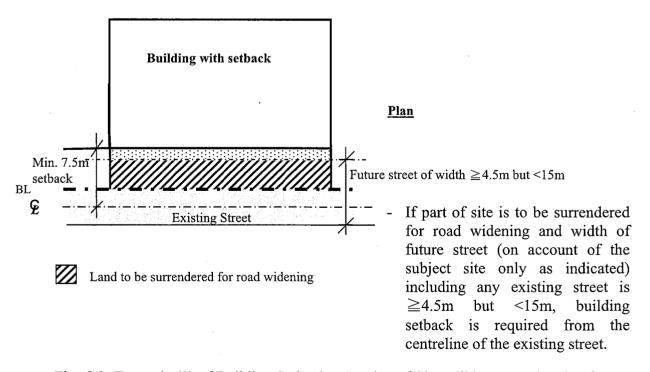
Example (2) of Building Setback – Portion of Site will be surrendered to form a future street
